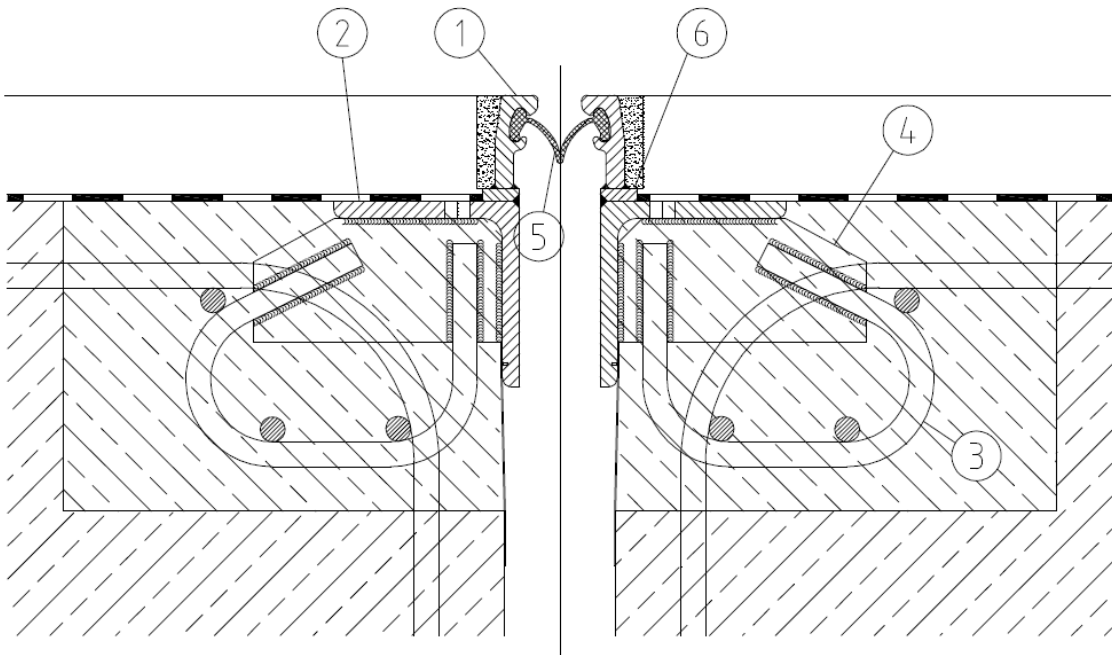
Exemplary cross section of the nosing expansion joint Fahrbahnübergangskonstruktion Typ SP, Type SP-e, including anchorage, pavement thickness >75 mm – 180 mm
